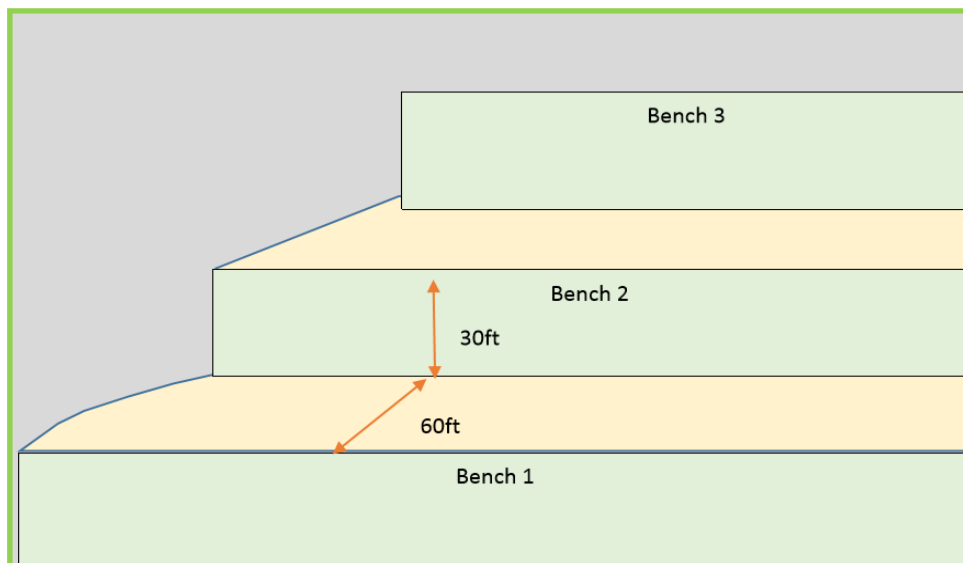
Typical (Idealized) benching plan where the width is at least twice the value of the height of the bench.
